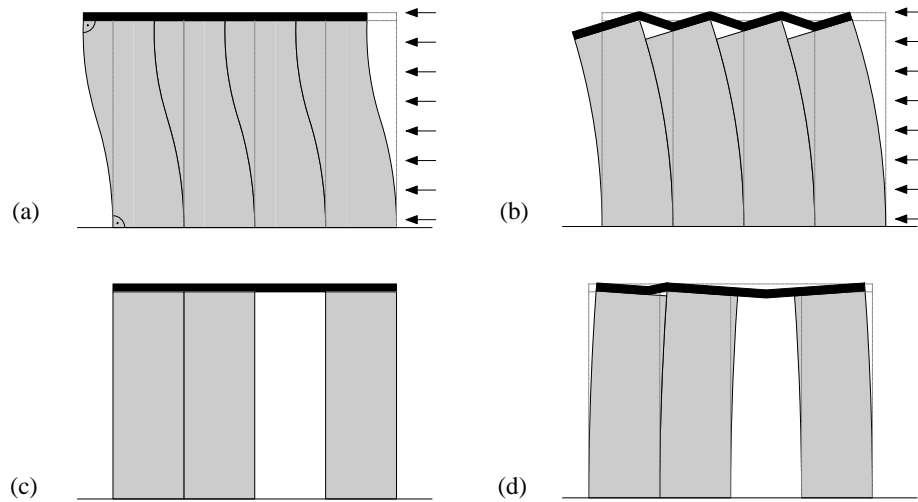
Glass panel deformation (a) lateral load - rigid roof (b) lateral load - soft roof (c) façade openings or glass breakage - rigid roof (d) façade openings or glass breakage - soft roof
